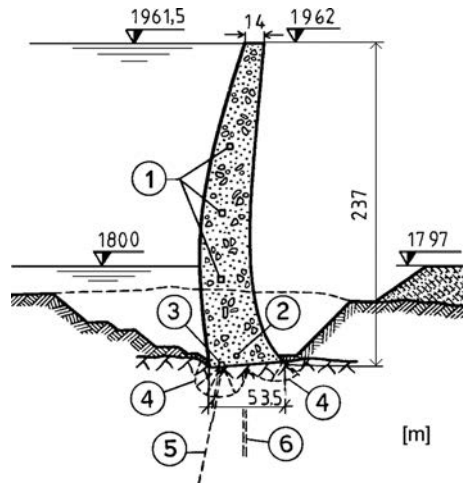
Mauvoisin dam. (1) Inspection galleries; (2) drainage gallery; (3) grouting gallery; (4) zones of consolidation grouting; (5) grout curtain; (6) drainage holes.
